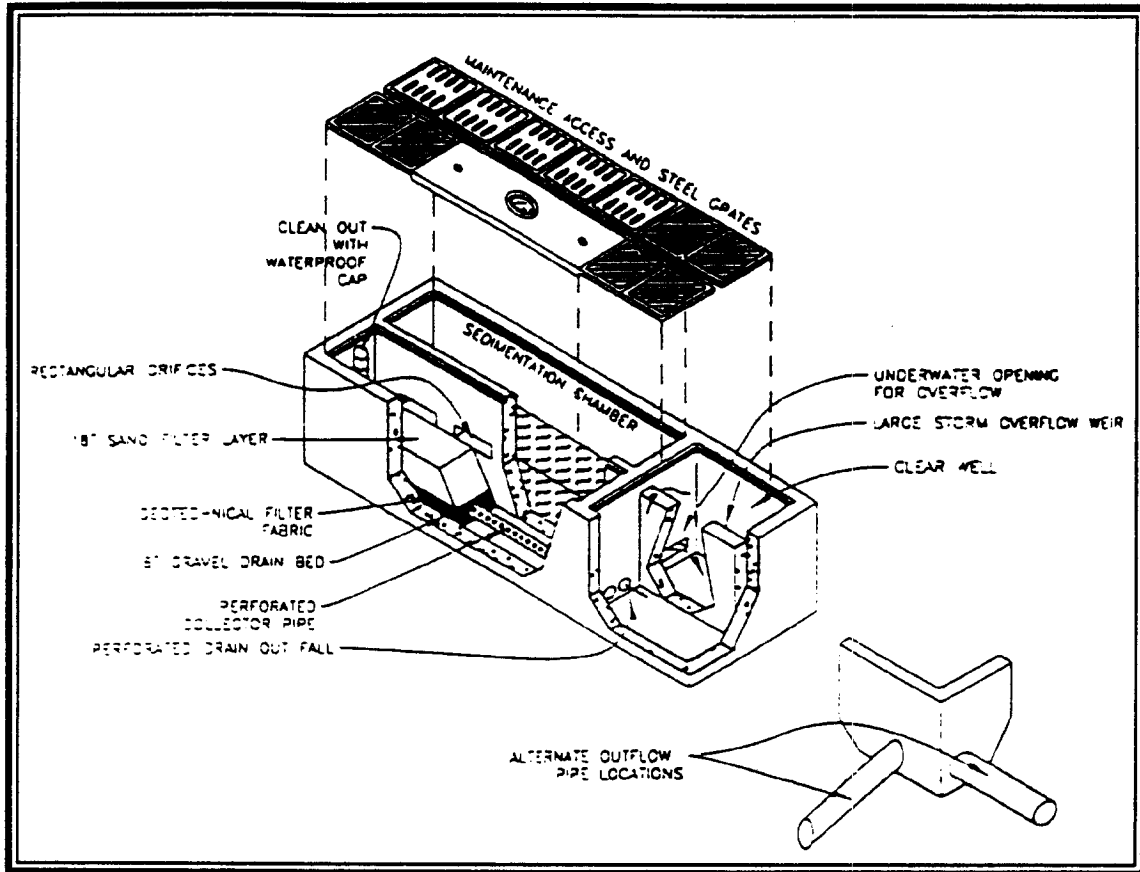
B-1 shows a schematic drawing of the Delaware Sand Filter as used in Virginia. The system consists of two parallel concrete trenches connected by close-spaced wide notches in the wall dividing the trenches. The trench adjacent to the site being served is the sedimentation chamber. When accepting sheet flow, it is fitted with a grated cover. Concentrated stormwater may also be conveyed to the chamber in enclosed storm drain pipes. The second chamber, which contains the sand filter, is always fitted with a solid cover.
